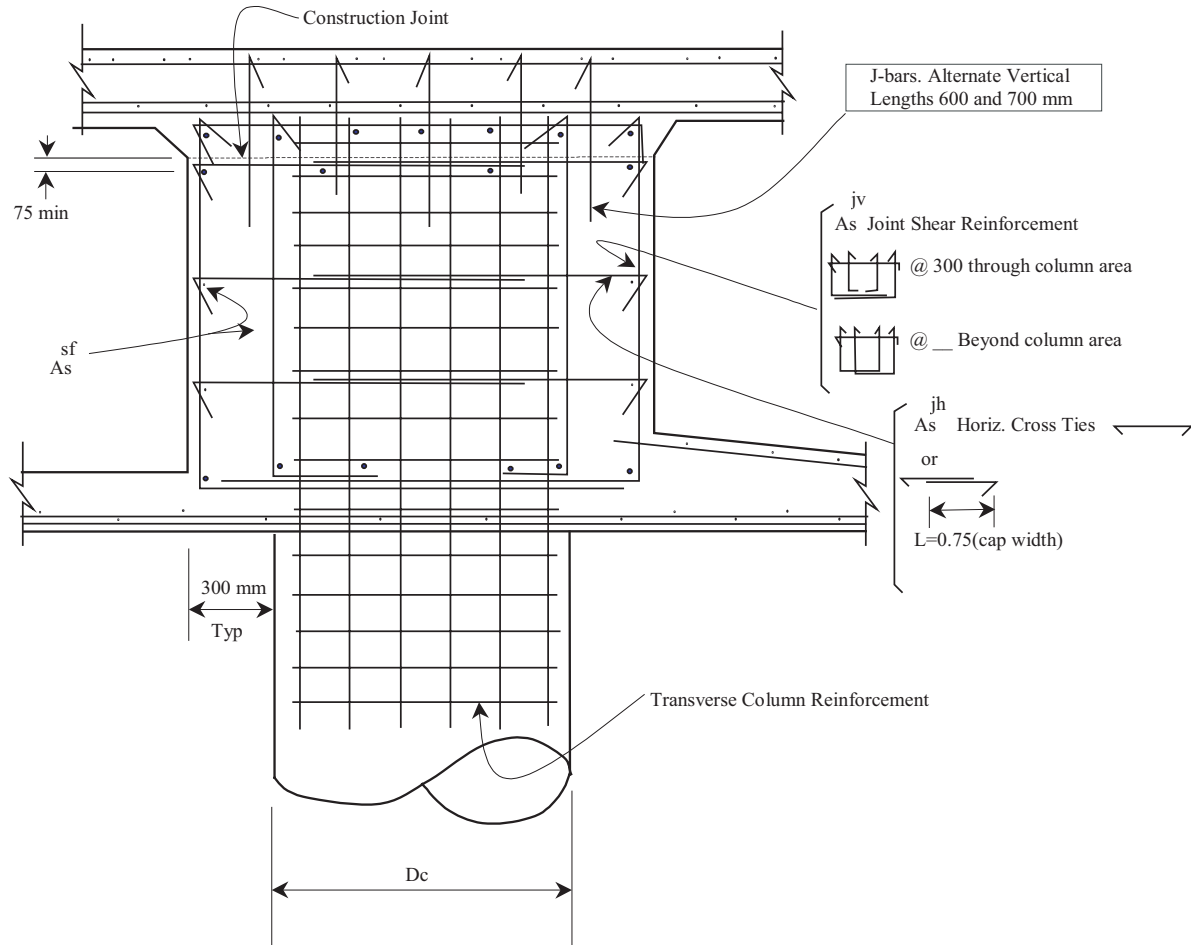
Additional Joint Shear Steel for Skewed Bridges<sup>13</sup>
